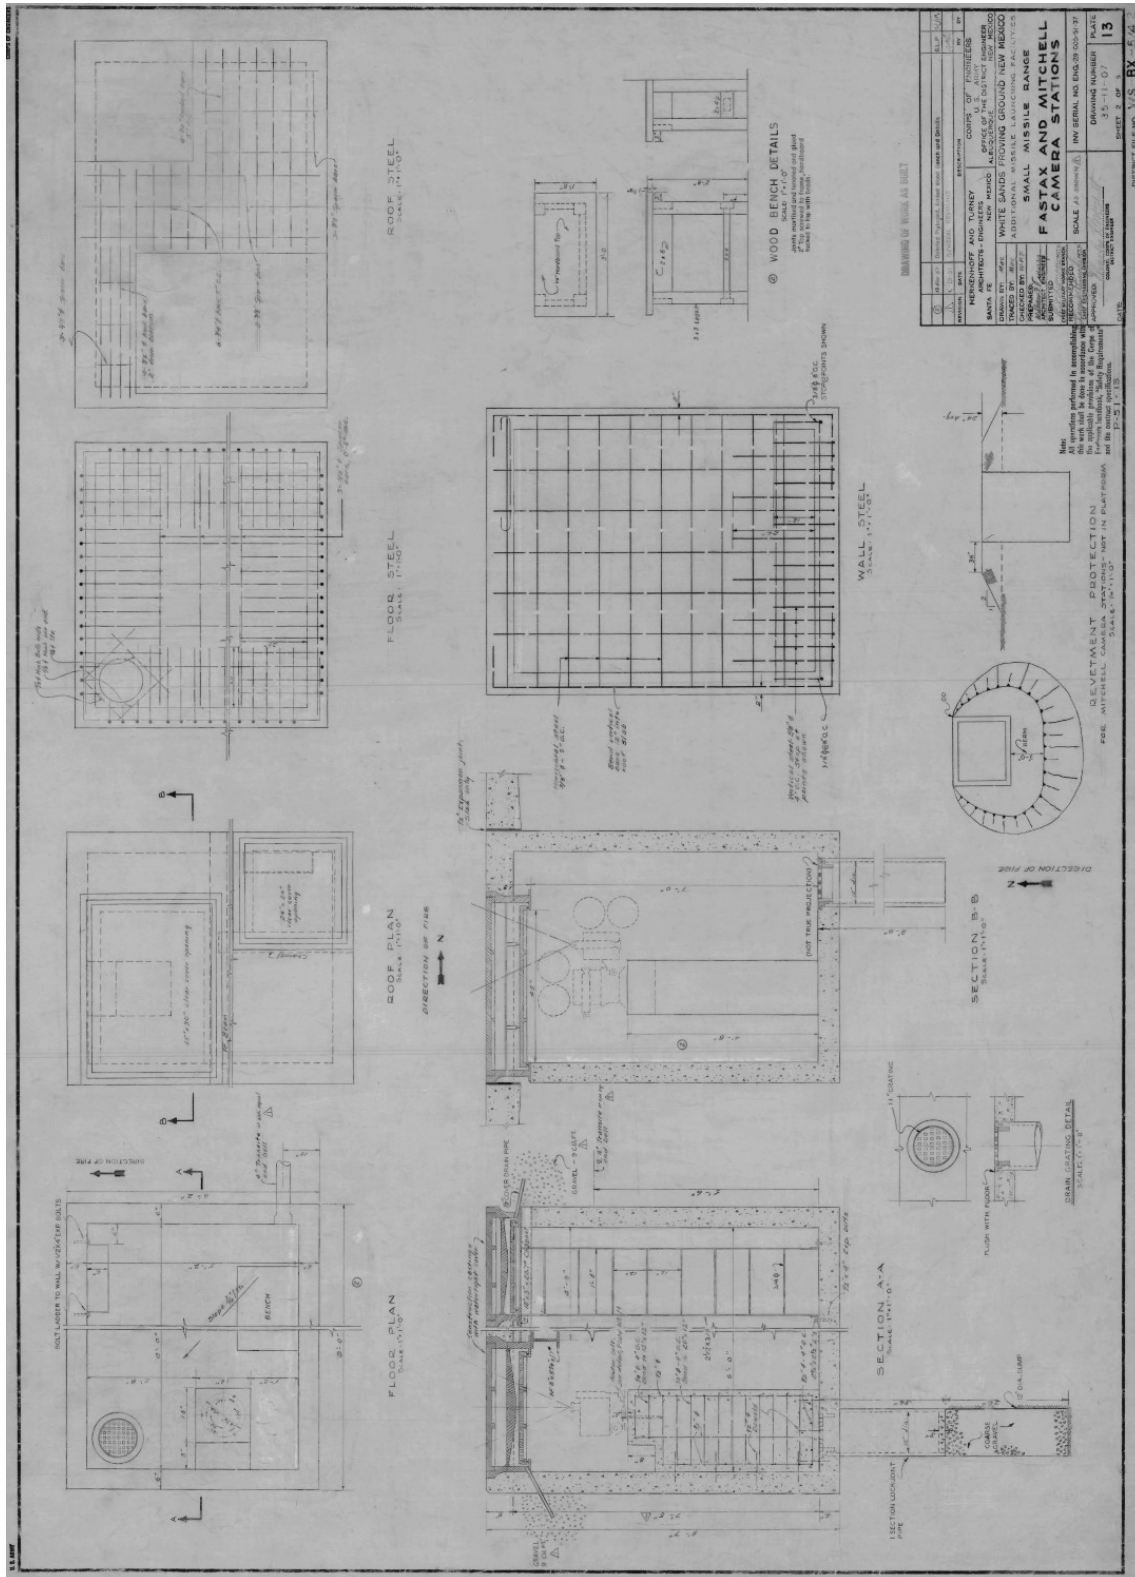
Schematic drawing of Fastax/Mitchell Camera Shelter from 1953 WS-BX plans.
